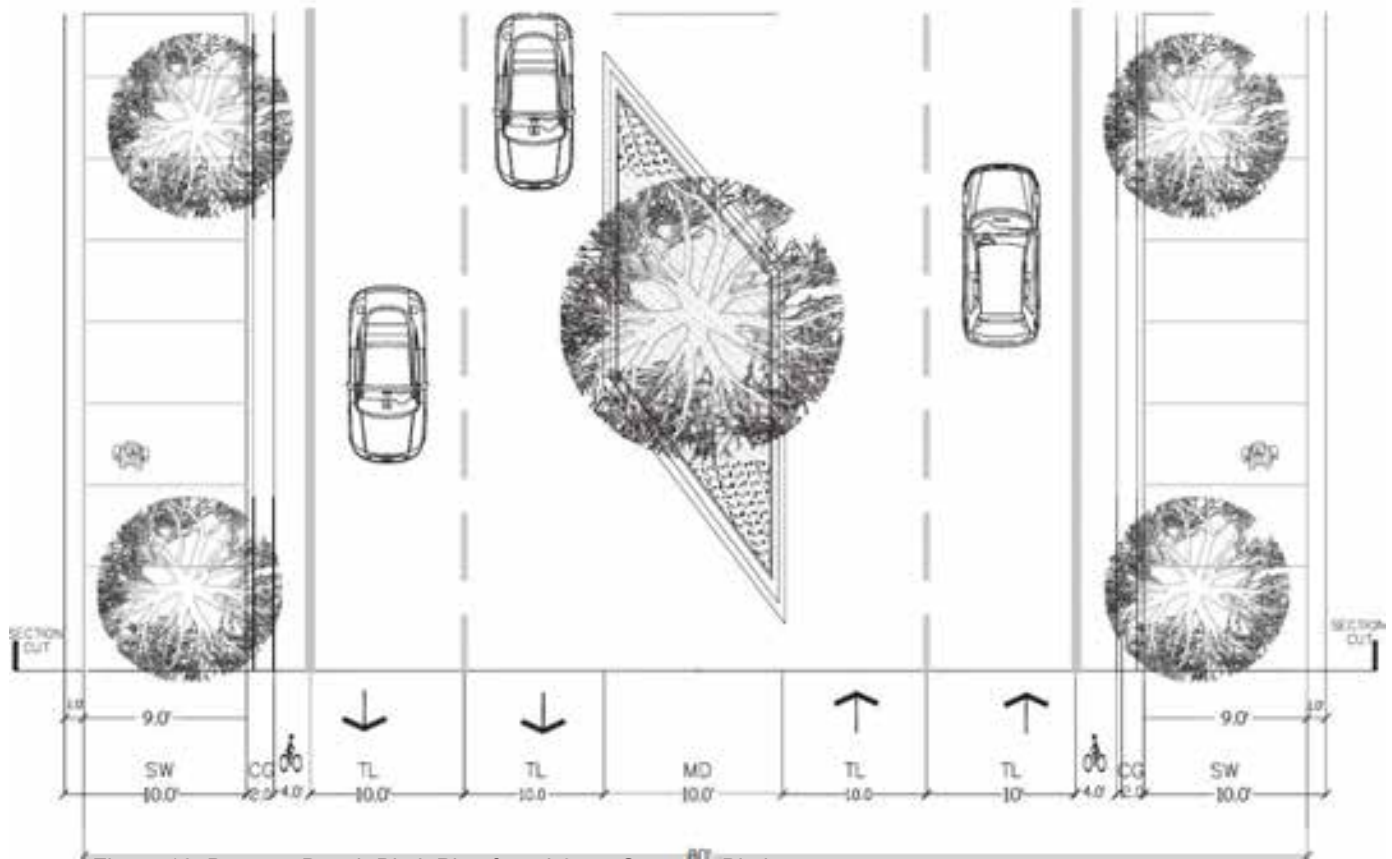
Boynton Beach Blvd. Plan from I-95 to Seacrest Blvd.
